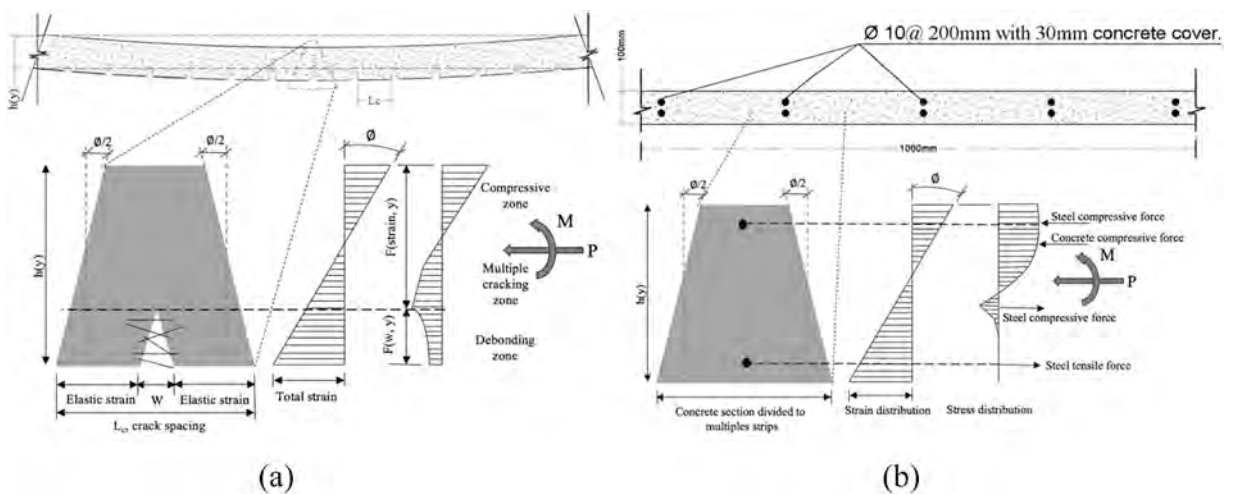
Sectional analysis of the basin walls, a- UHDC section, and b- reinforced concrete section.
